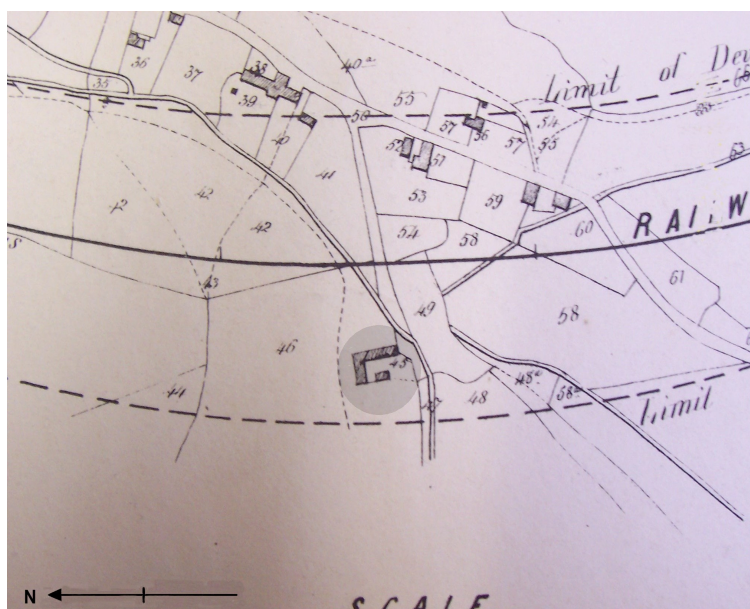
1845 Railway Plan showing Pigeon House Cottages
